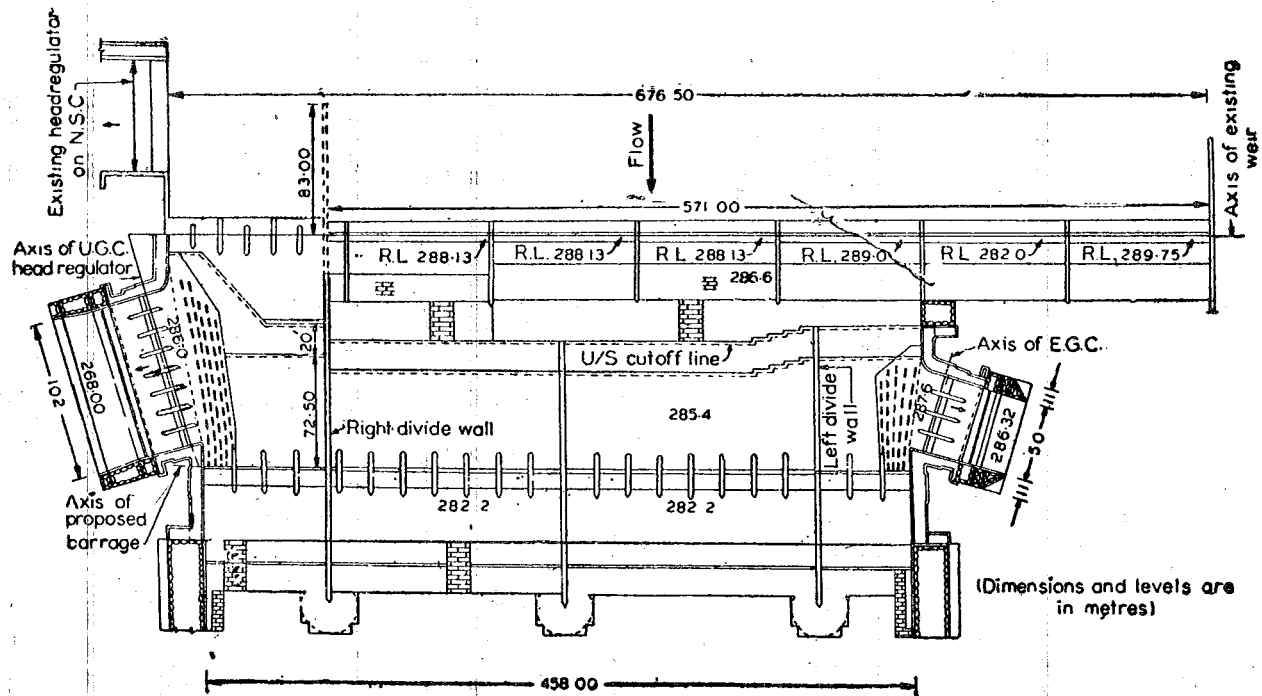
(a) Layout Plan of New Bhimgoda Headworks (Barrage) on Ganga river in U.P.
